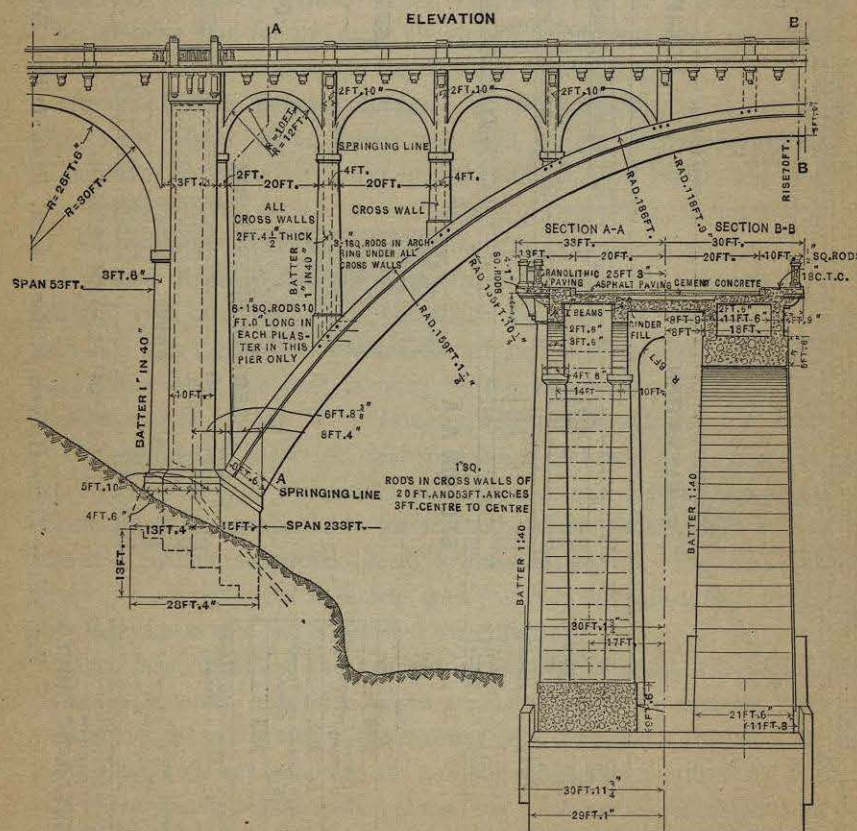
Walnut Lane Bridge, Philadelphia. (See p. 592.)
